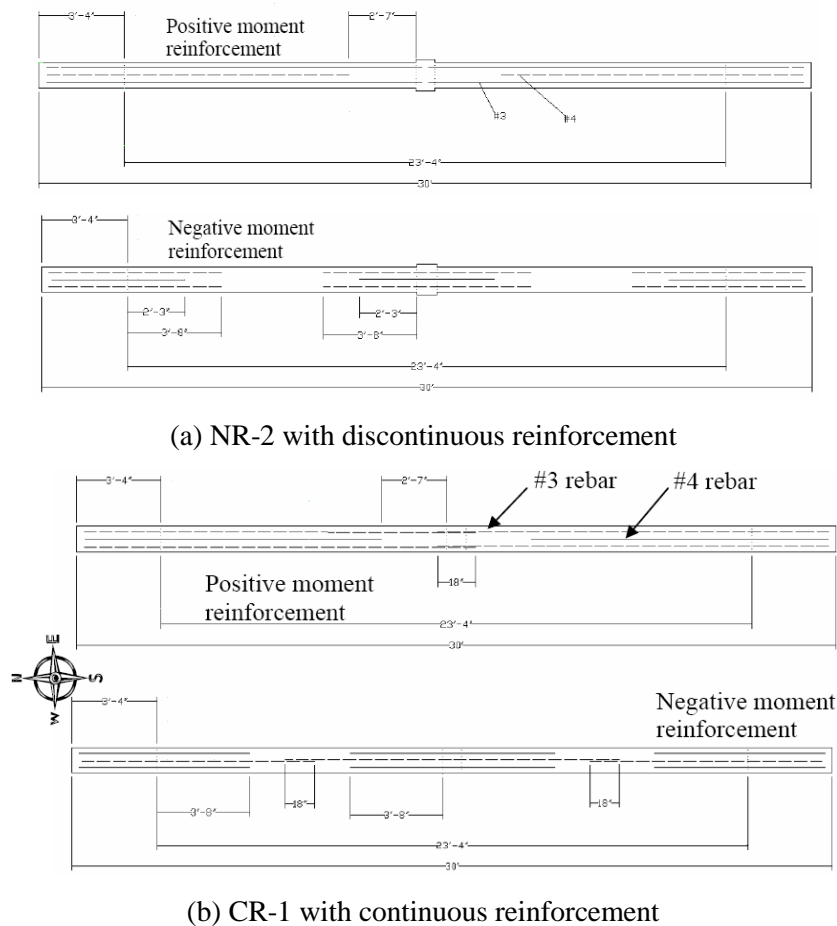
Detailing of test specimens in Orton's tests (Orton 2007)
